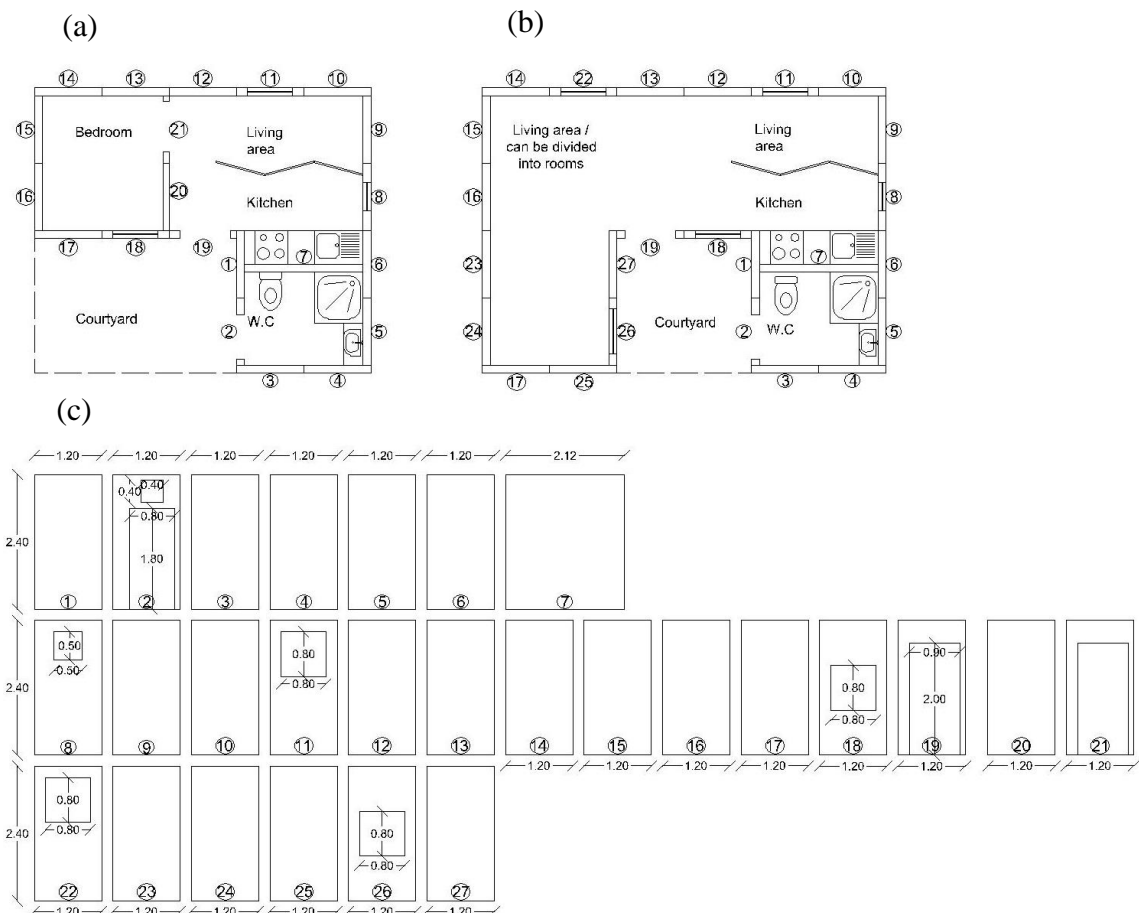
Concept 4- Panels arrangements: a) Basic plan with numbered panels, b) Extended plan with numbered panels, c) Numbered panels for both plans
